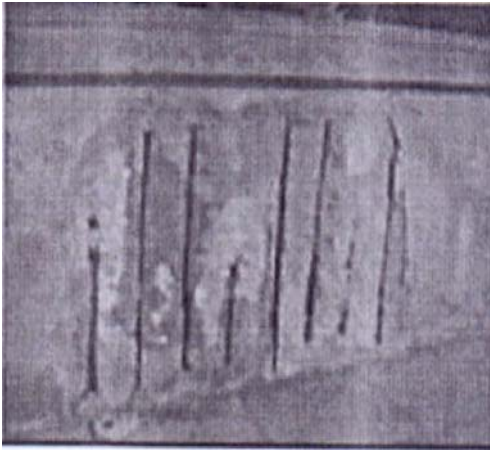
Spalled reinforced concrete wall showing exposed reinforcement bar
